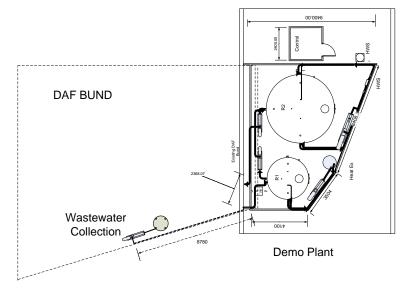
Layout of wastewater handling system within demonstration plant host site in 2010.
